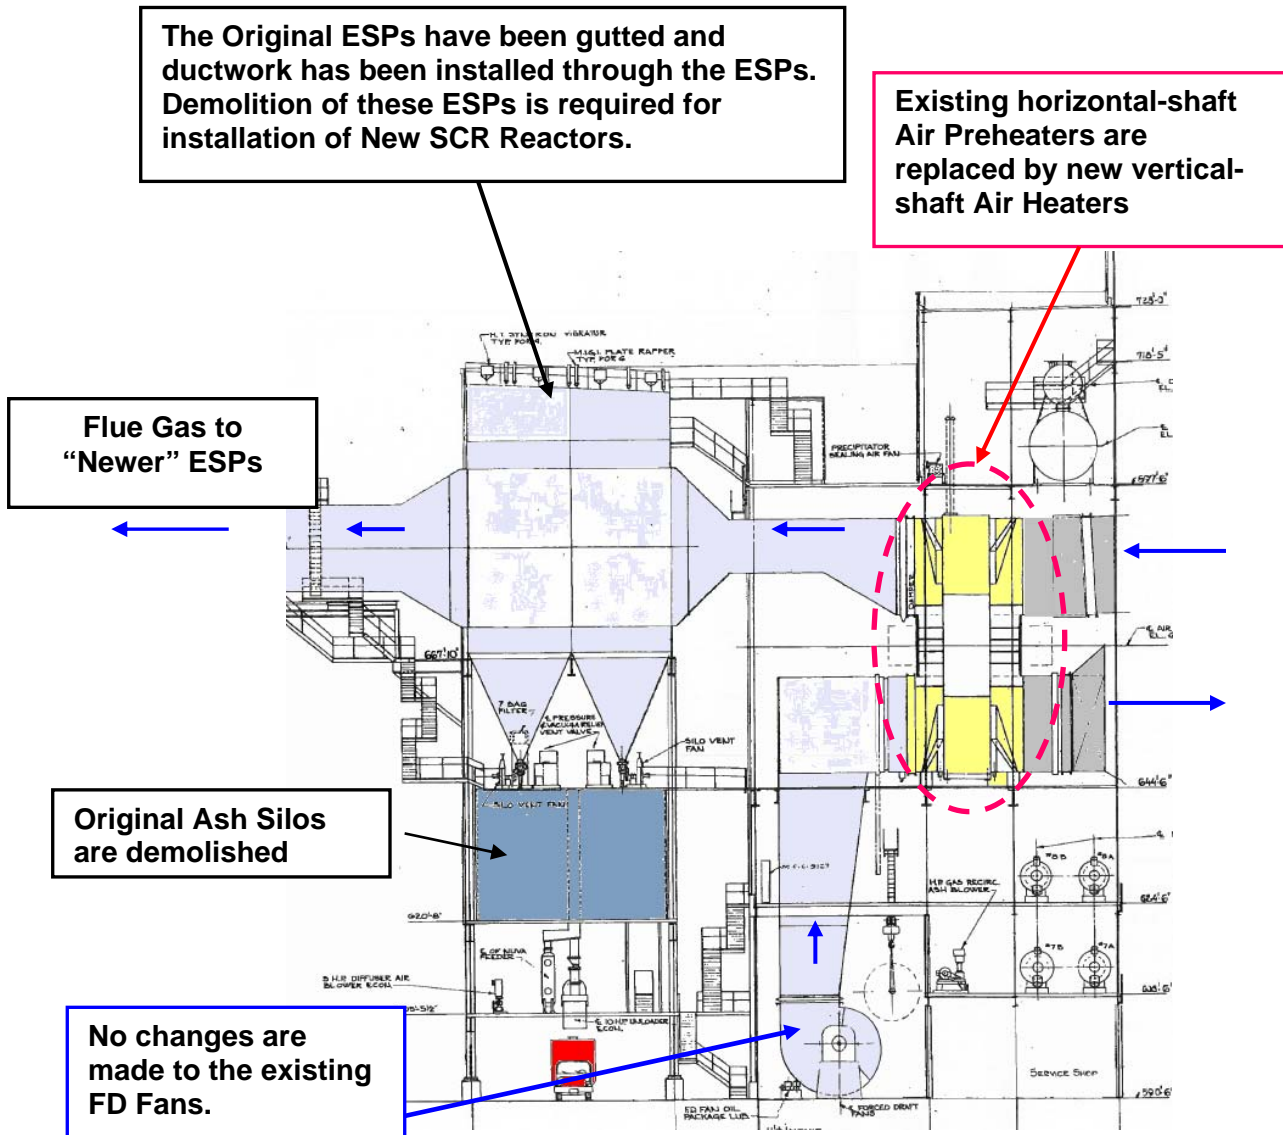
Original ESP and Air Preheater Arrangement on Avon Lake 9
